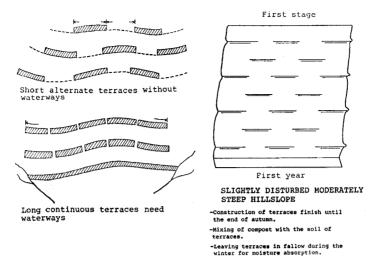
a. Alternate terracing after construction in slightly disturbed hillslope.
